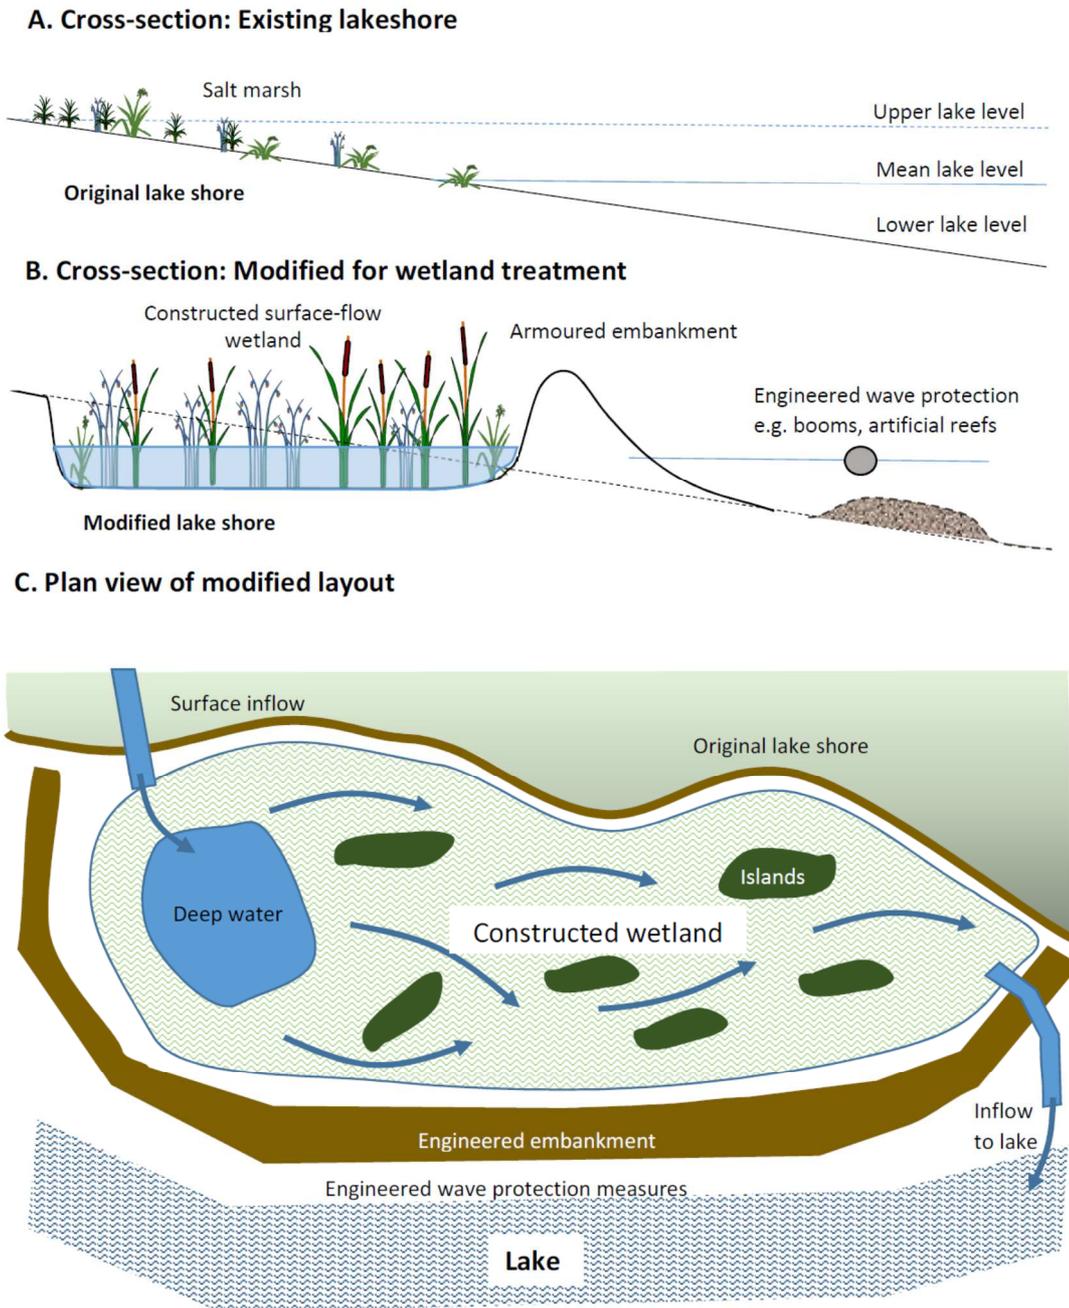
Conceptual plan for potential wetland construction in shallow littoral zones of the lake.
